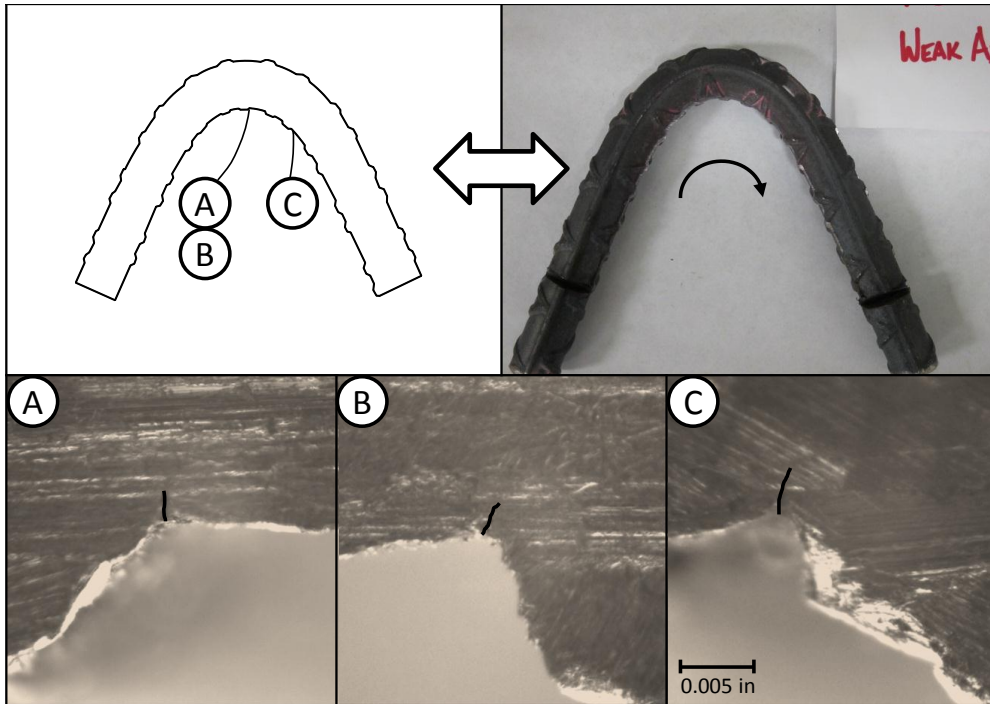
Cracks Identified After Bending for Specimen I-C-135-1.5-W
